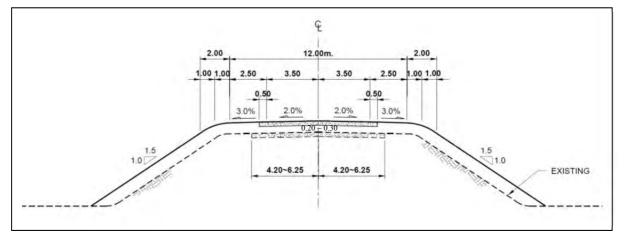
TYPICAL CROSS SECTION OF IMPROVEMENT OF EXISTING 2-LANE ROAD
